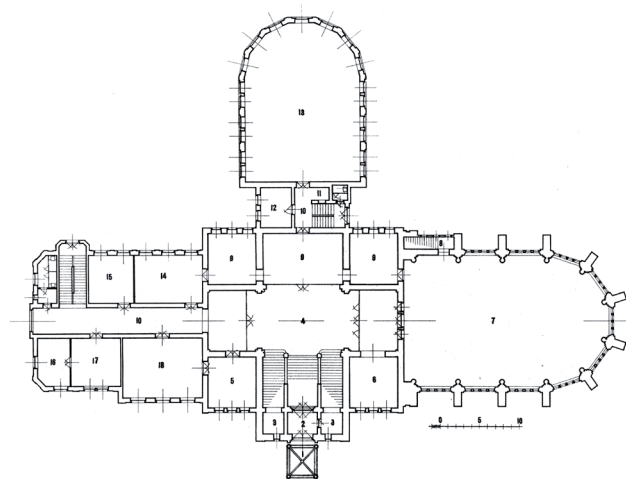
The first floor plan of the Library Building. (After [6, p. 454] [12, p. 23] [13, p. 284] [18]) 1. Connecting passage. 2. Lobby. 3. Small room. 4. Hall. 5. Professor's study. 5. Cloak room for students. 7. Reading room for students. 8. Stairs leading down to closets. 9. Reference library. 10. Passage. 11. Lift. 12. Classifying room. 13. Book-room. 14. Administration. 15. Reading room for Professor's assistants. 16. Librarian's study. 17. Librarian's reception-room. 18. Reading room for Professors.
